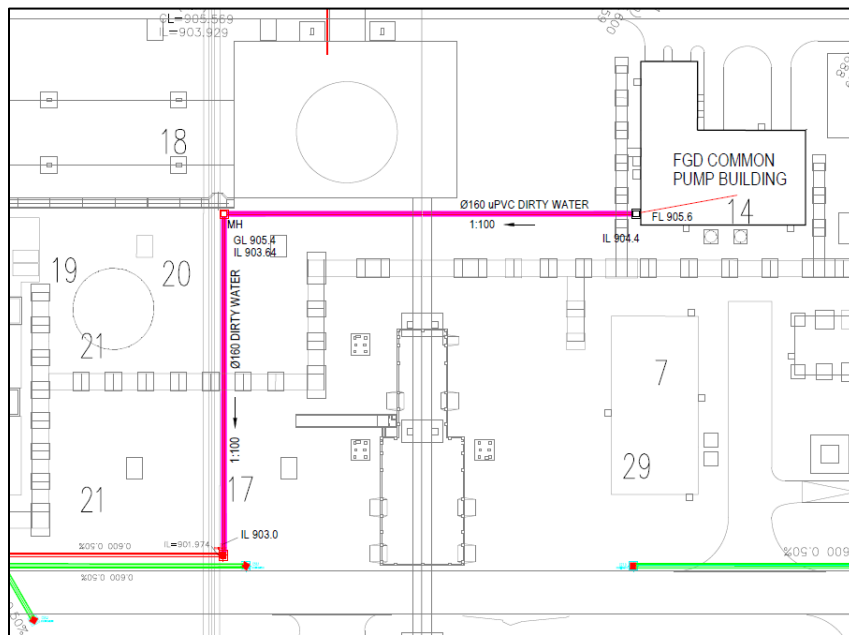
Layout plan showing the identified sump connection point for the FGD Common Pump Building
